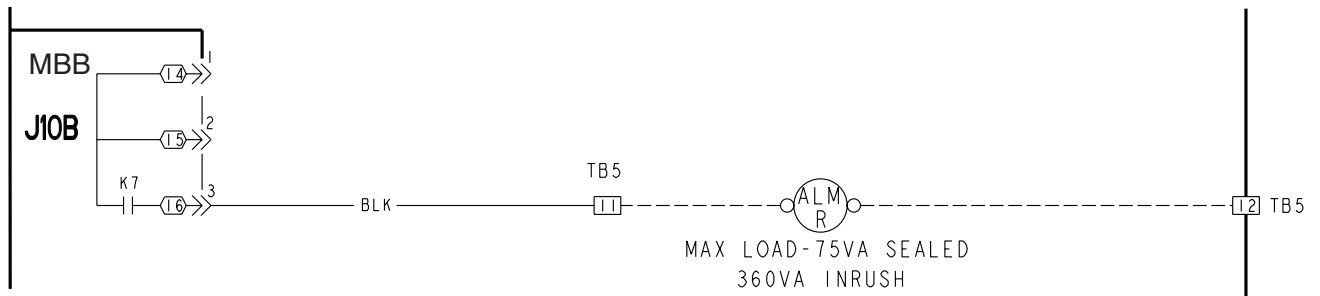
Remote Alarm Relay Accessory Wiring; All Models, 115, 230 V
